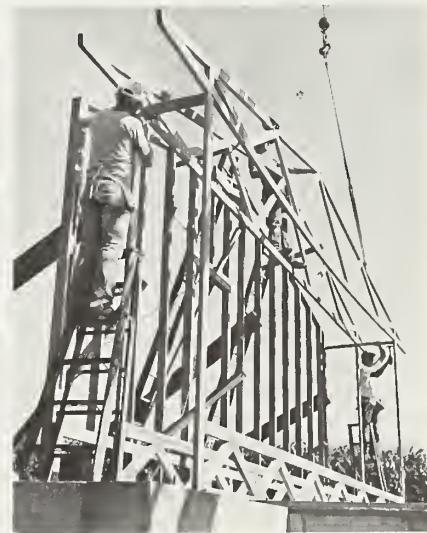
With the prefabricated endwall already in place, the first frames were set at 8:45 a.m. Spacer blocks were used to connect the frames at the top.
